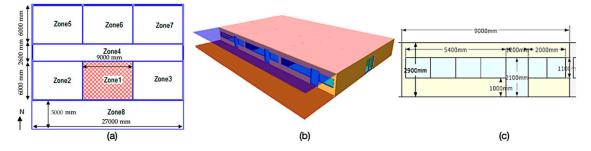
EDSL TAS numerical model: (a) Plan, (b) perspective, and (c) front façade of the classroom.
